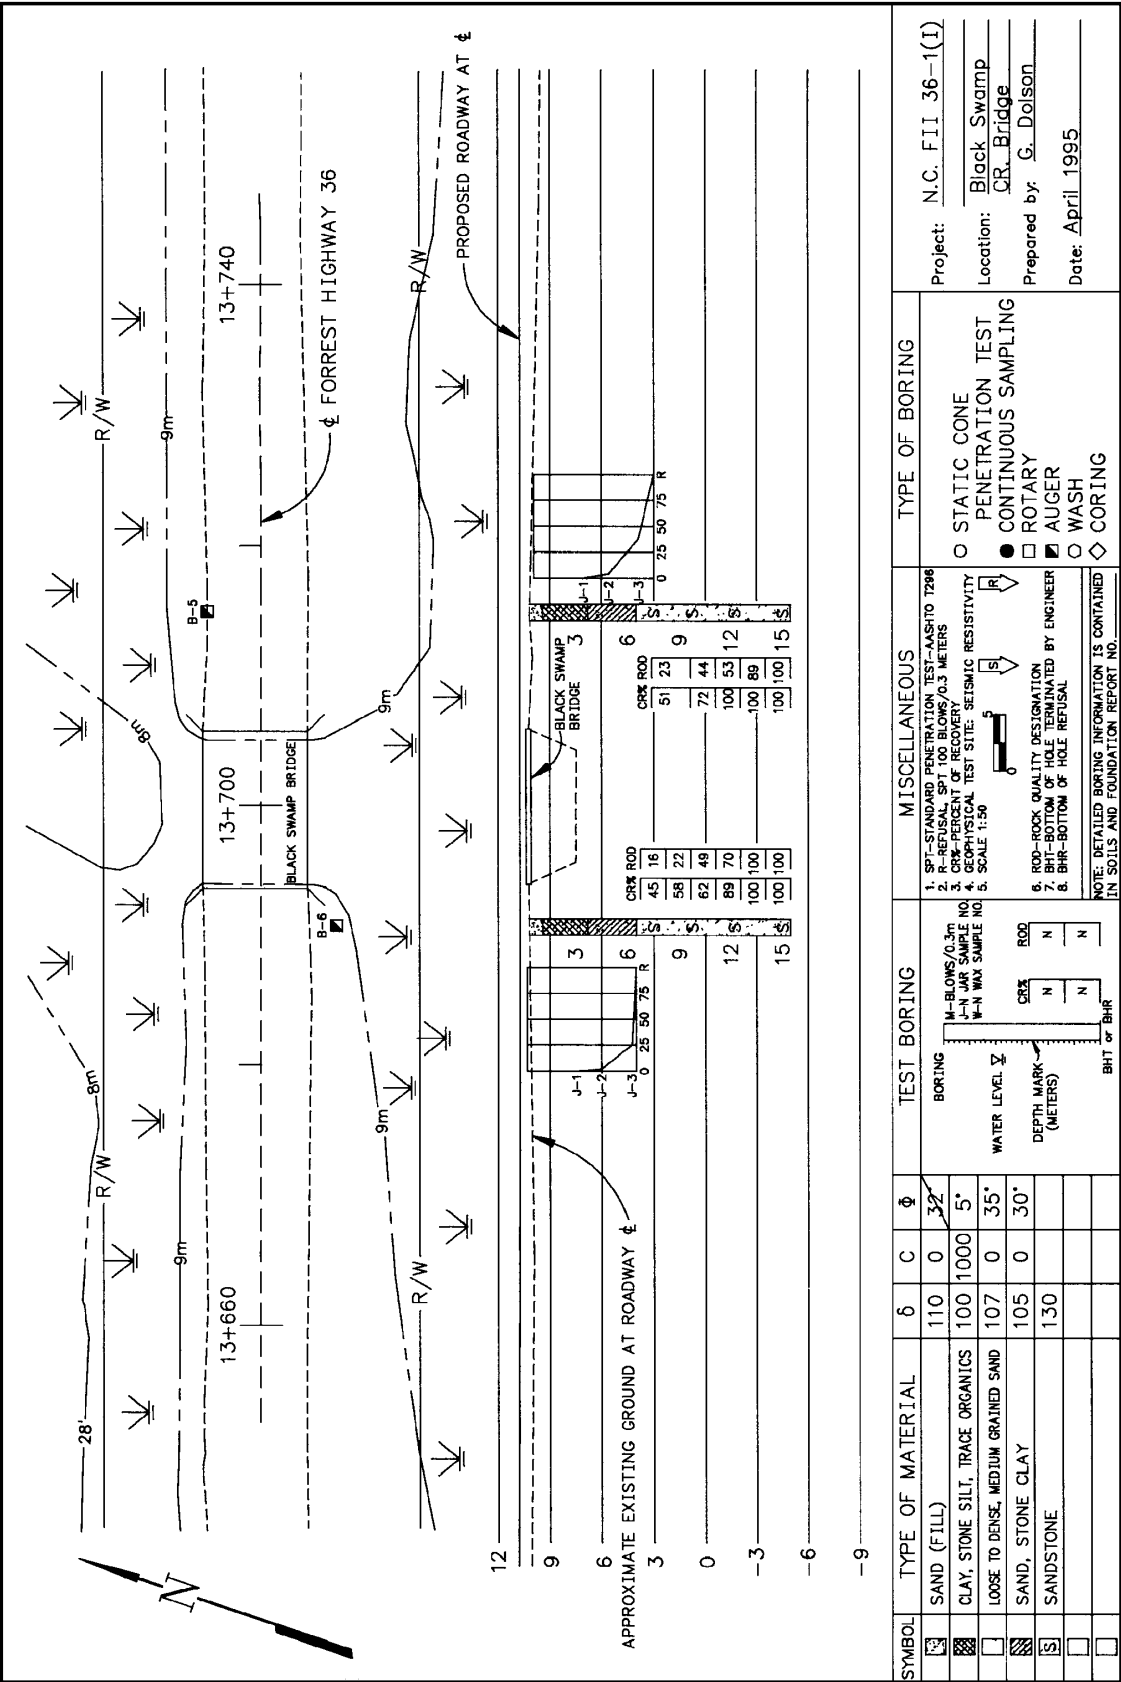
H SOILS AND FOUNDATION PLAN AND PROFILE SHEET
